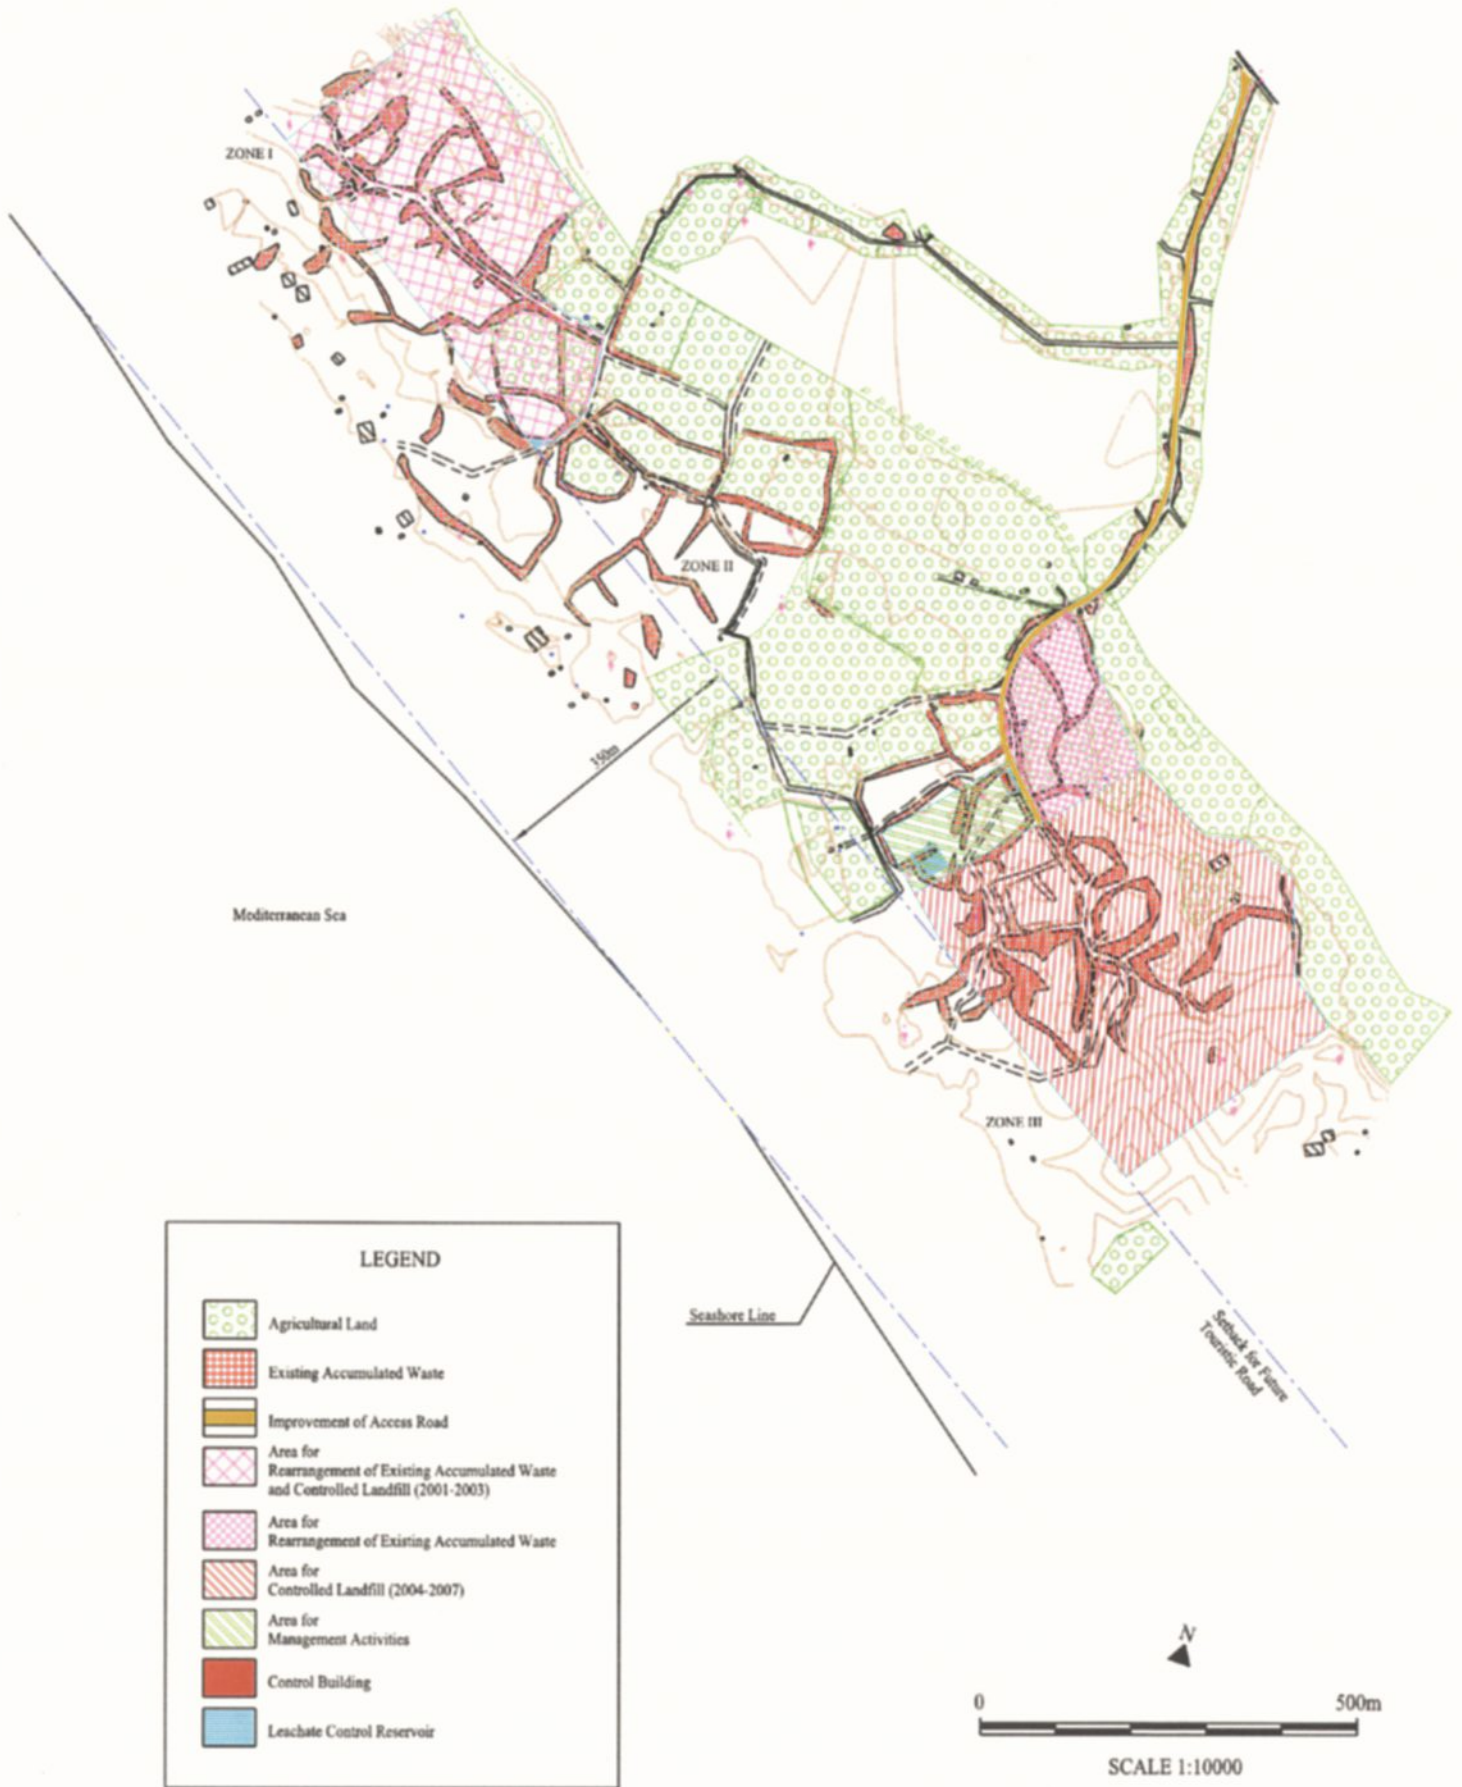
Overall Rehabilitation Plan of Al-Bassa Disposal Site
